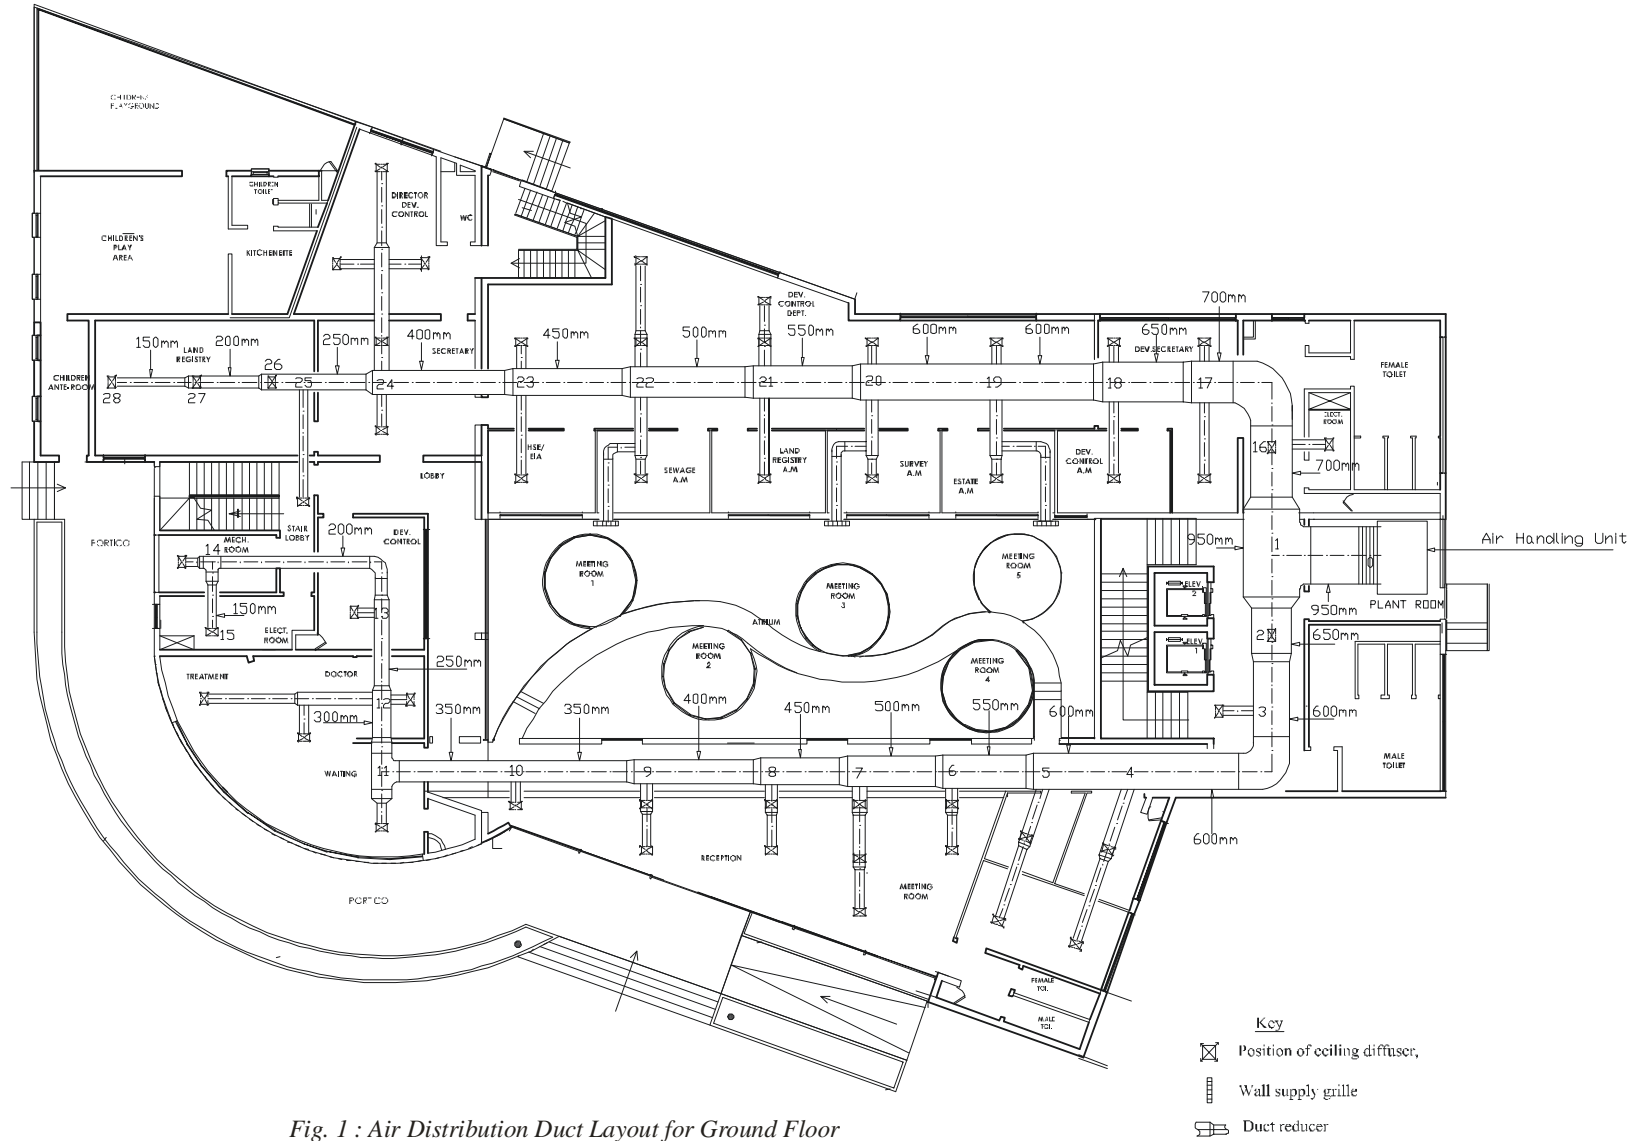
Air Distribution Duct Layout for Ground Floor
